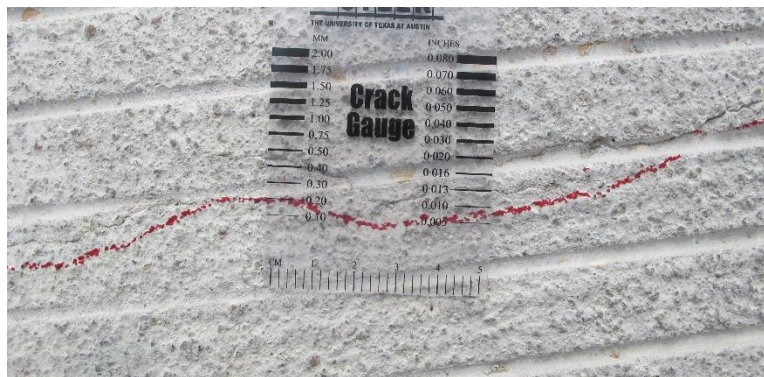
14 Deck Surface Crack in Bastrop Bridge
